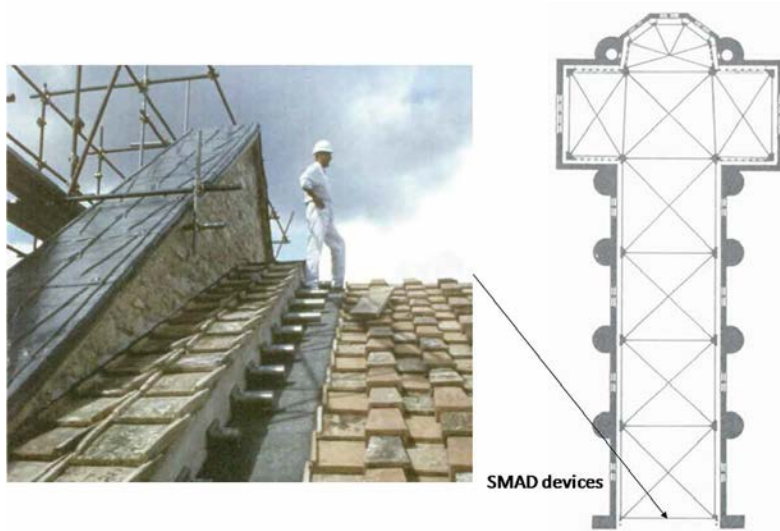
Steel beam and spring/damper system installed throughout the entire roof.
